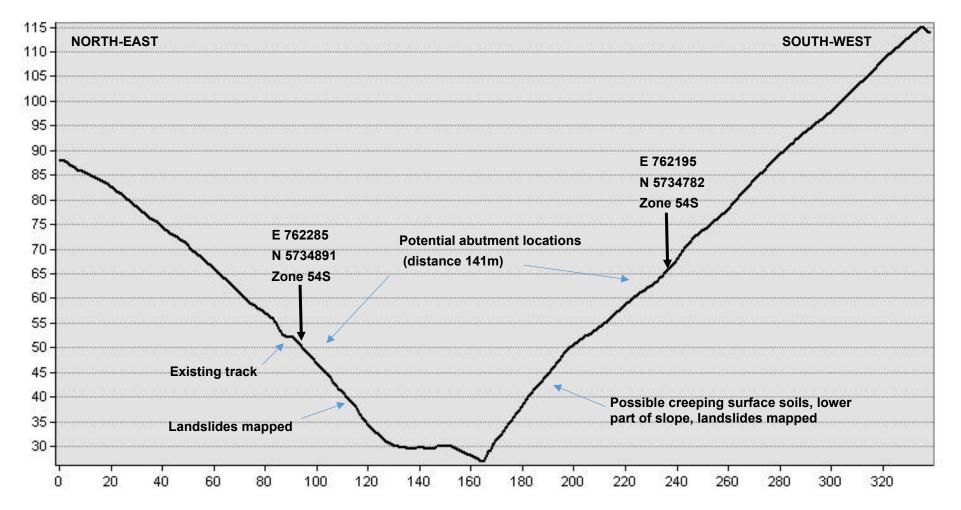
Terrain cross section at the potential Bridge 1 abutment location, looking south-east (axes in m)
